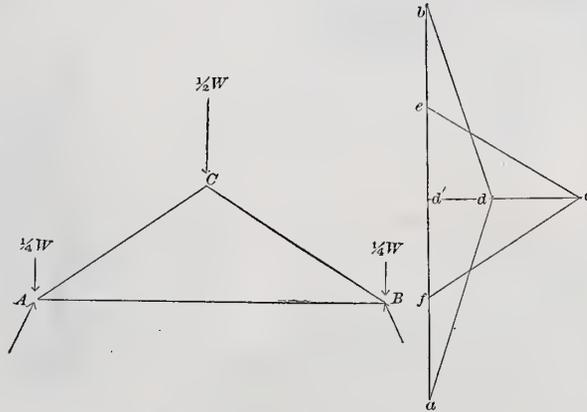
Stress Diagram For Roof Truss, A B C.
